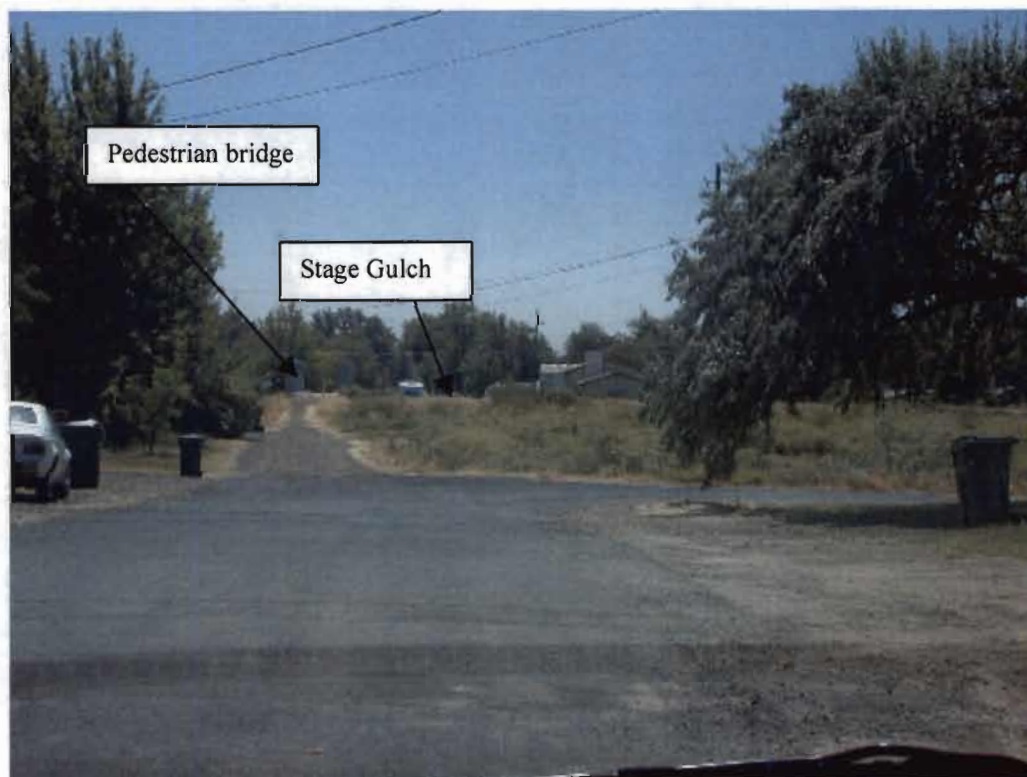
View looks south at Stage Gulch flood plain. taken from NE Wayne St. and Harding Ave. on north side of Stage Gulch.
